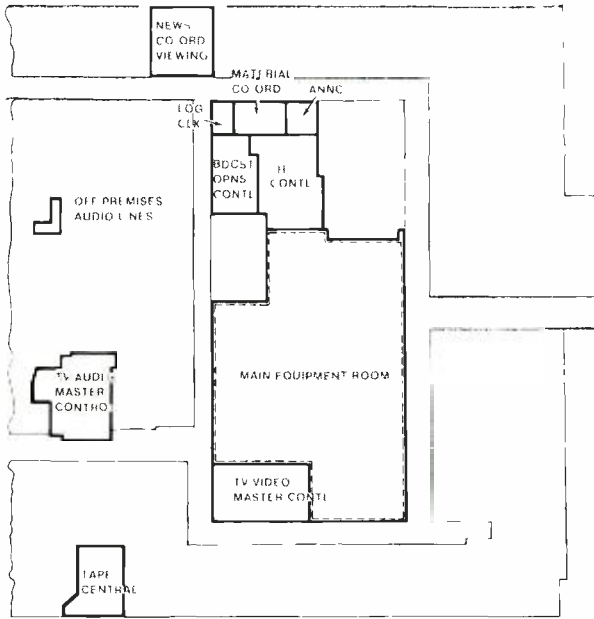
Television Central floor plan before rebuilding. This is the fifth-floor studio section, west end.
